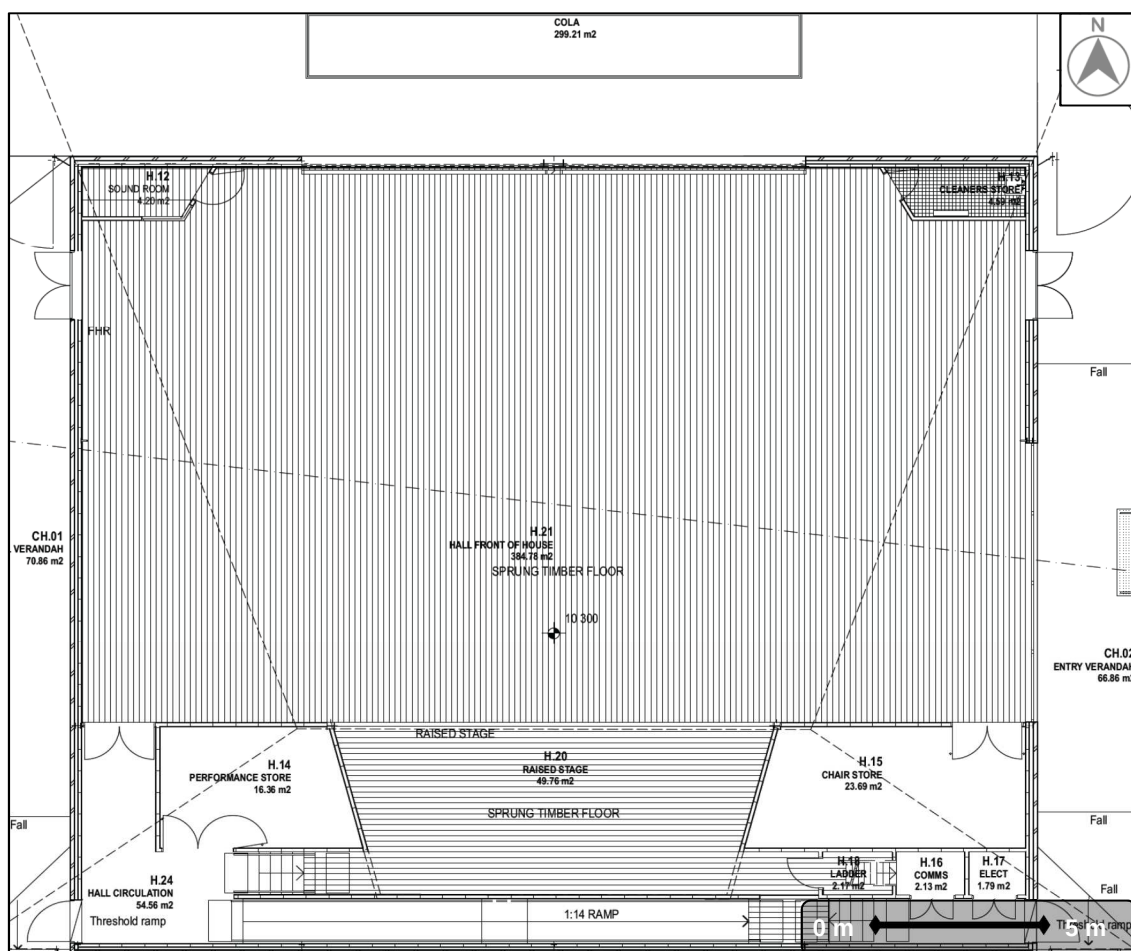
Proposed school hall – ground floor plan (source: EIS)
